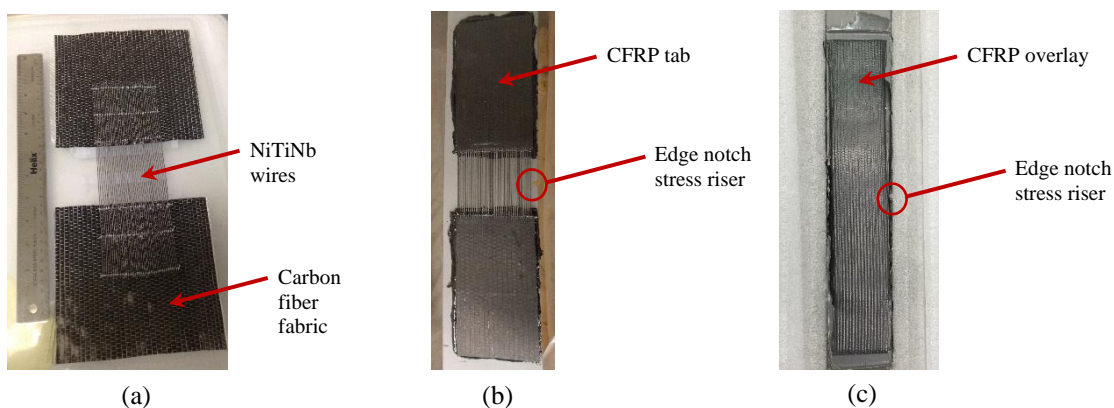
Fabrication of SMA/CFRP patches for retrofit of crack sensitive details in steel structures. (a) Preparation of SMA wires and carbon fiber fabric; (b) installation of the SMA wires embedded in CFRP tabs on a steel plate with edge notch stress riser; and (c) completed patch with CFRP overlay.
